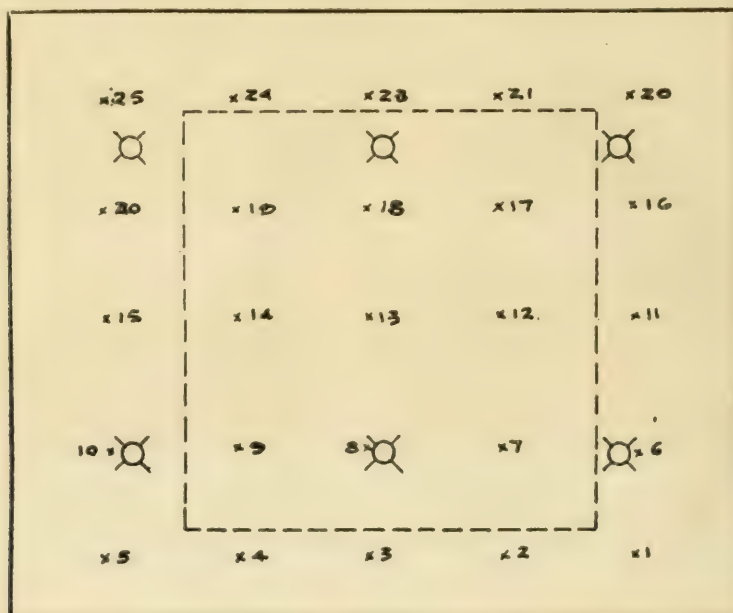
Sketch showing location of outlets and test stations in typical class room.
